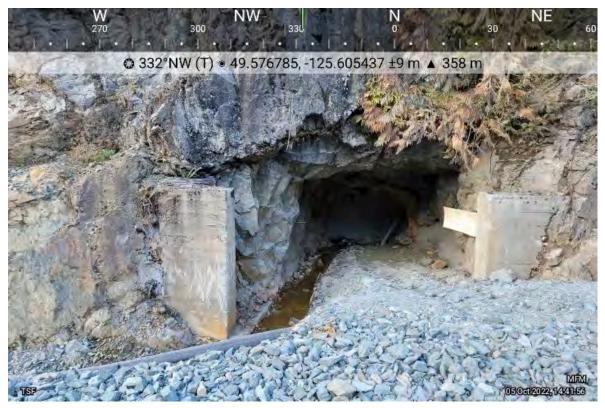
Lynx TDF West Abutment showing 10 Level East Portal, looking north. Ongoing drainage flows from the portal. The portal is to be plugged and sealed before next dam raise construction.
